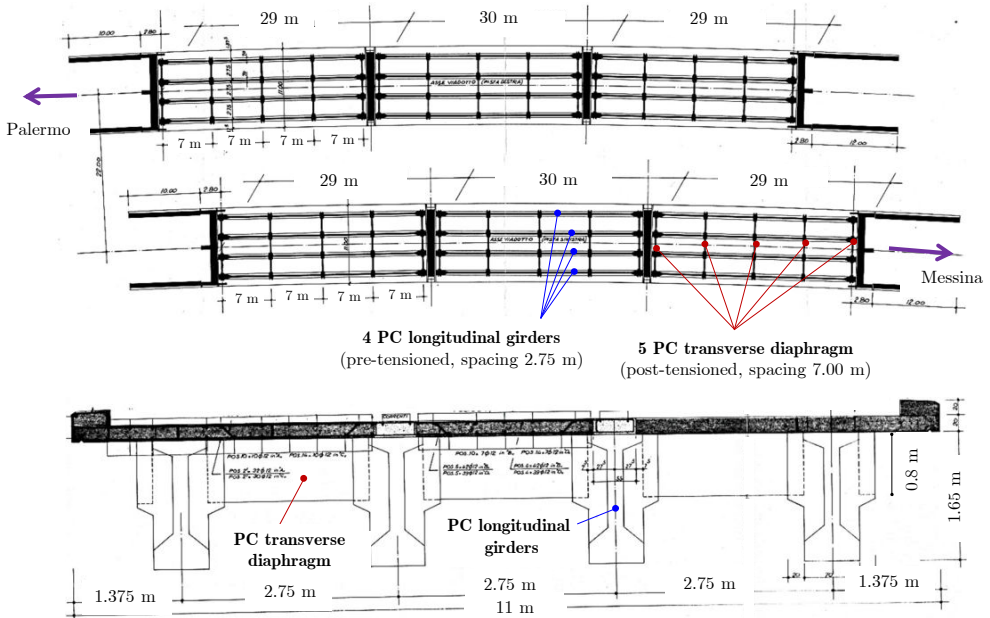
Original design drawings of the Longano viaduct: horizontal section of the bridge deck (top) and transverse section of the bridge deck (bottom).
